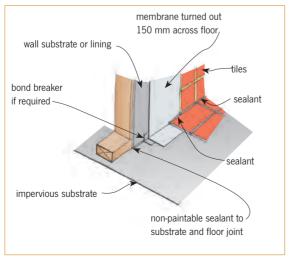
Wall to floor junction where floor impervious (e.g. steel-trowelled concrete).
